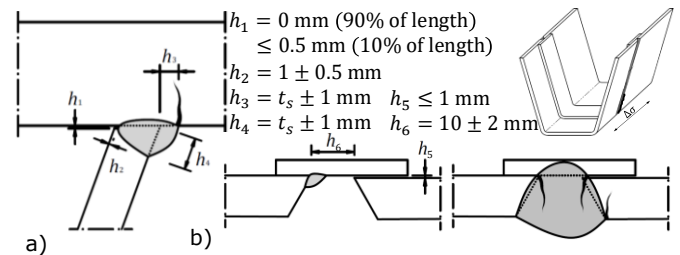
Geometrical restrictions to some welds a) the stiffener-to-deck weld; and b) the stiffener splice weld with backing strip.
